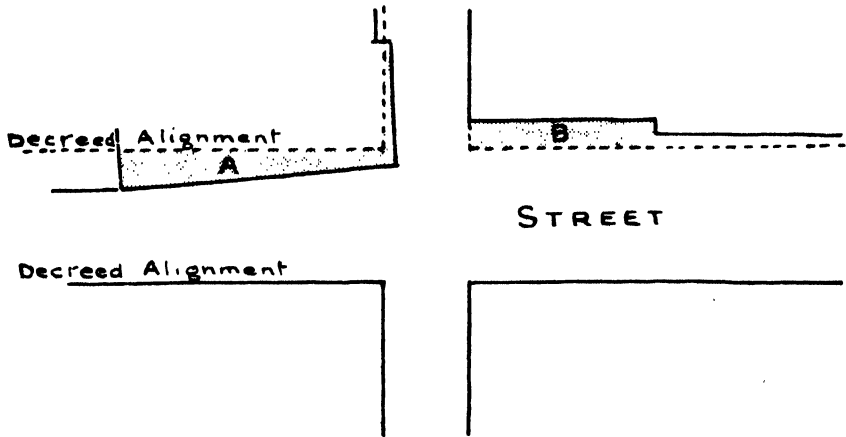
DETAIL PLAN OF STREET IMPROVEMENT WORK (Egypt).
